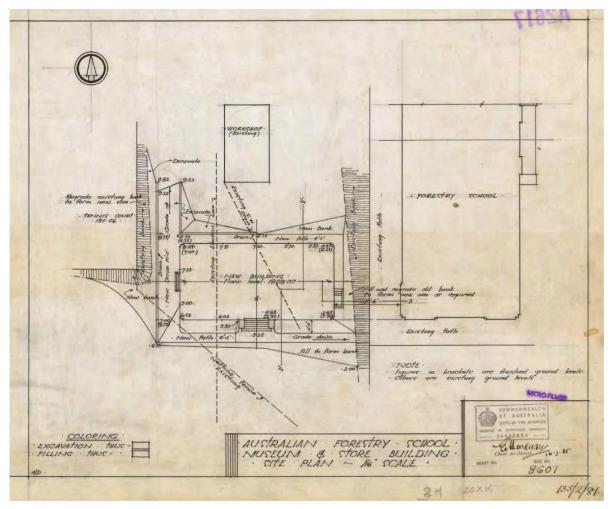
Site layout of Museum and Store, 1938 (NAA #7689914)
